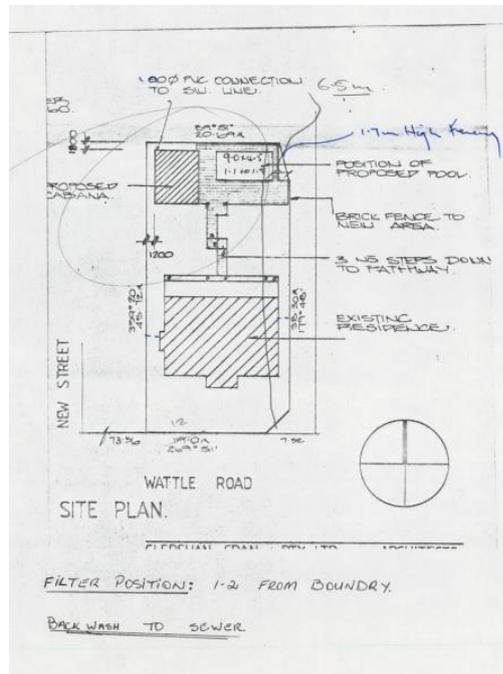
Design for addition of swimming pool and outbuilding (cabana). (Source: BP 1986, BH\_86\_4260)
